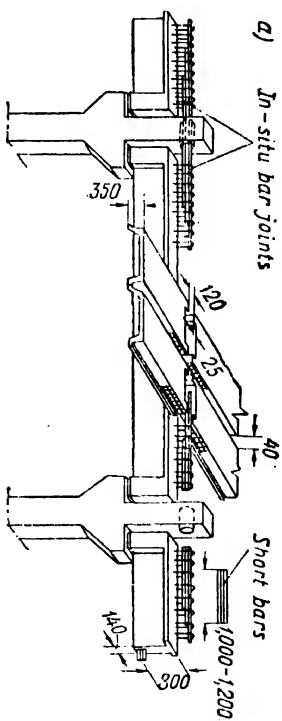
A frame of composite (precast and in-situ) reinforced concrete
